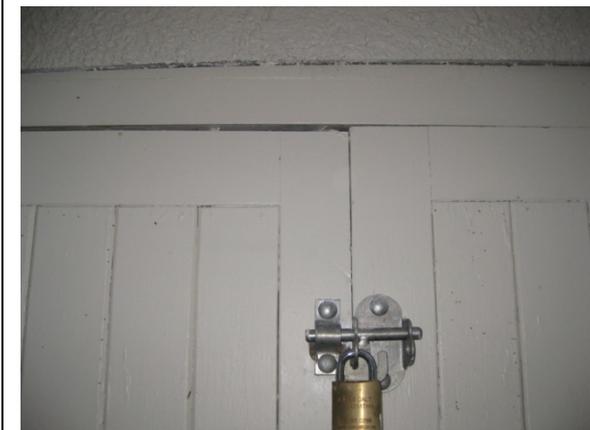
Gaps opening up between timber elements in the doorframe on the north side.
